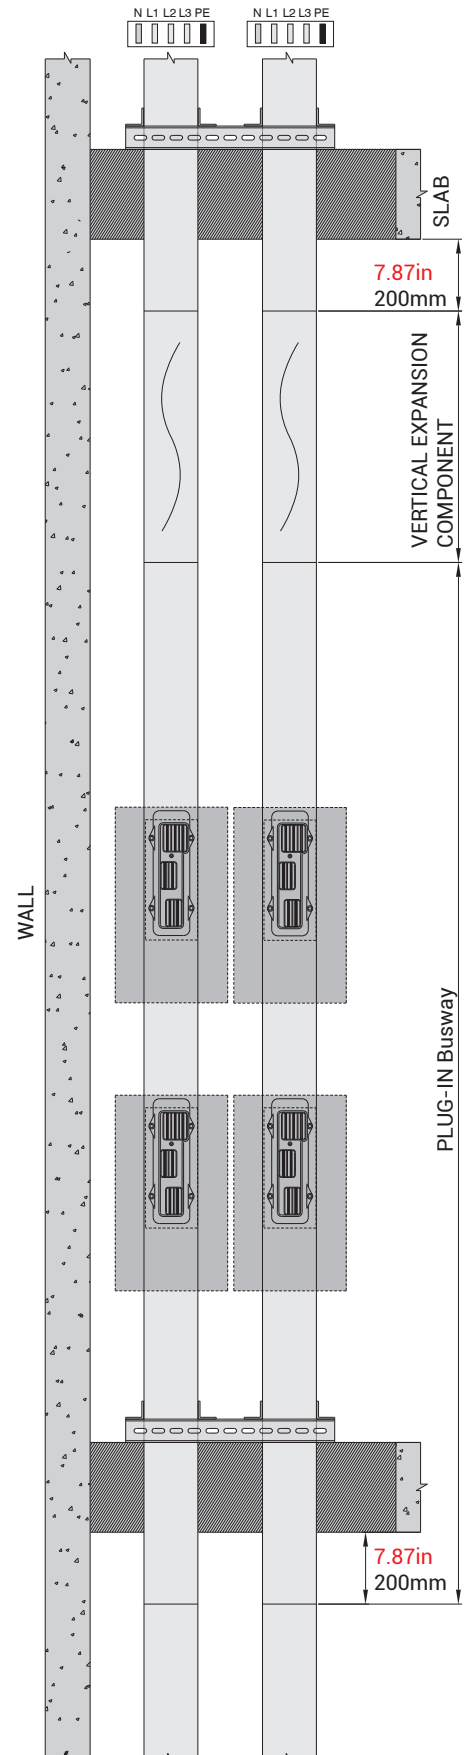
MINIMUM DIMENSIONS BETWEEN 2 RISERS
